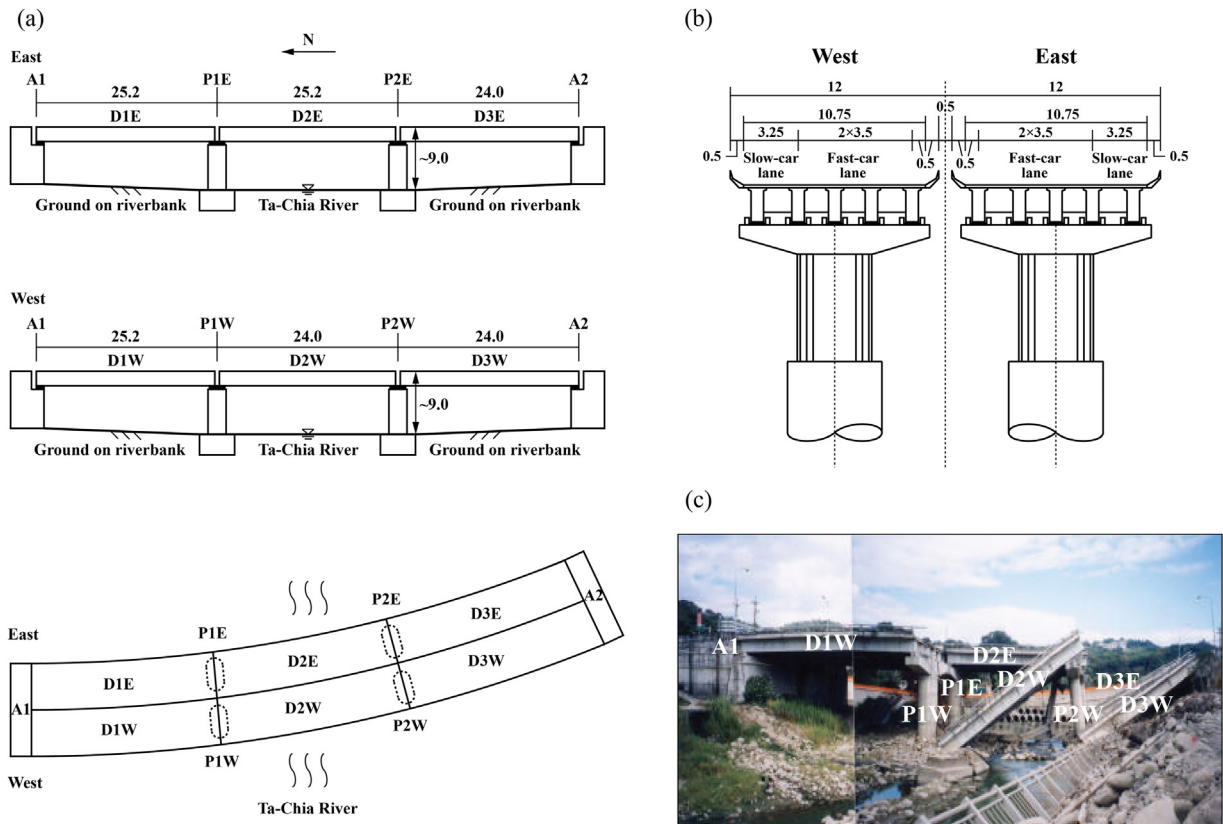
Shi-Wei Bridge during the 1999 Chi-Chi earthquake: (a) elevation and plan views of original bridge (unit, m); (b) typical section of bridge (unit: m); (c) collapsed bridge (Fig. 8a and b is generated based on information provided by Kosa et al. [69]; Fig. 8c is modified from Kosa et al. [69]).
